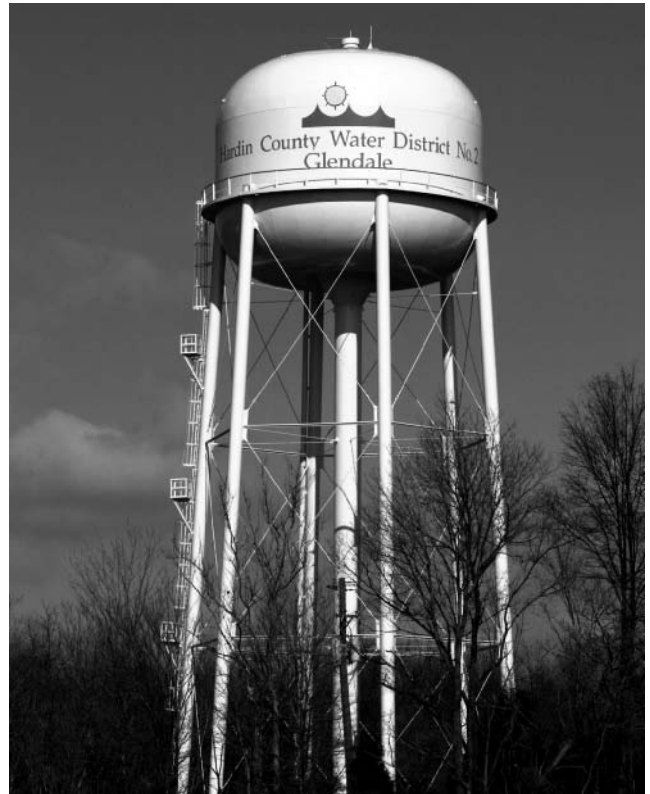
Traditional multicolumn elevated storage tank (Source: Caldwell Tank, Inc.)
